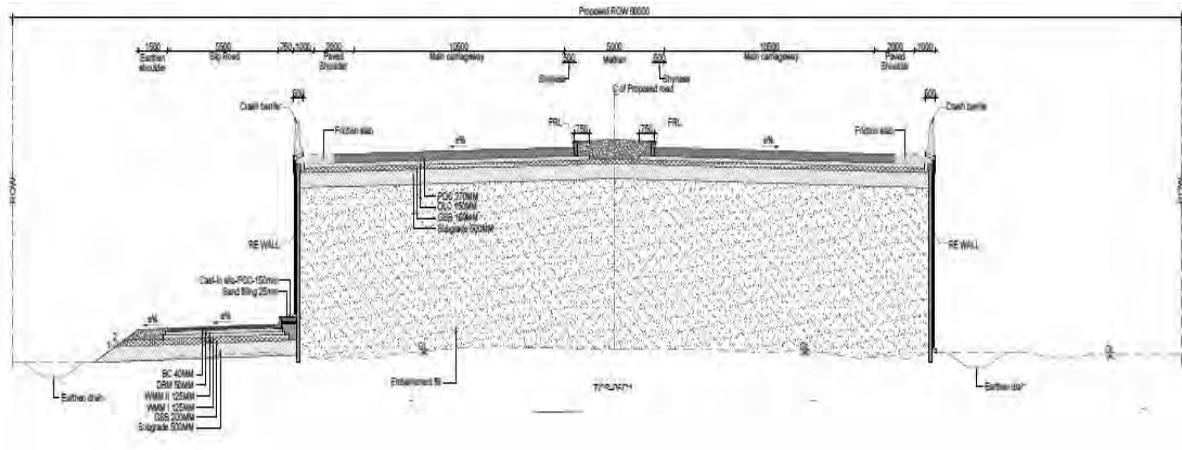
TCS-6C1 Typical Four Lane Underpass Cross Section with Slip Roads in Bypass & Realignment
